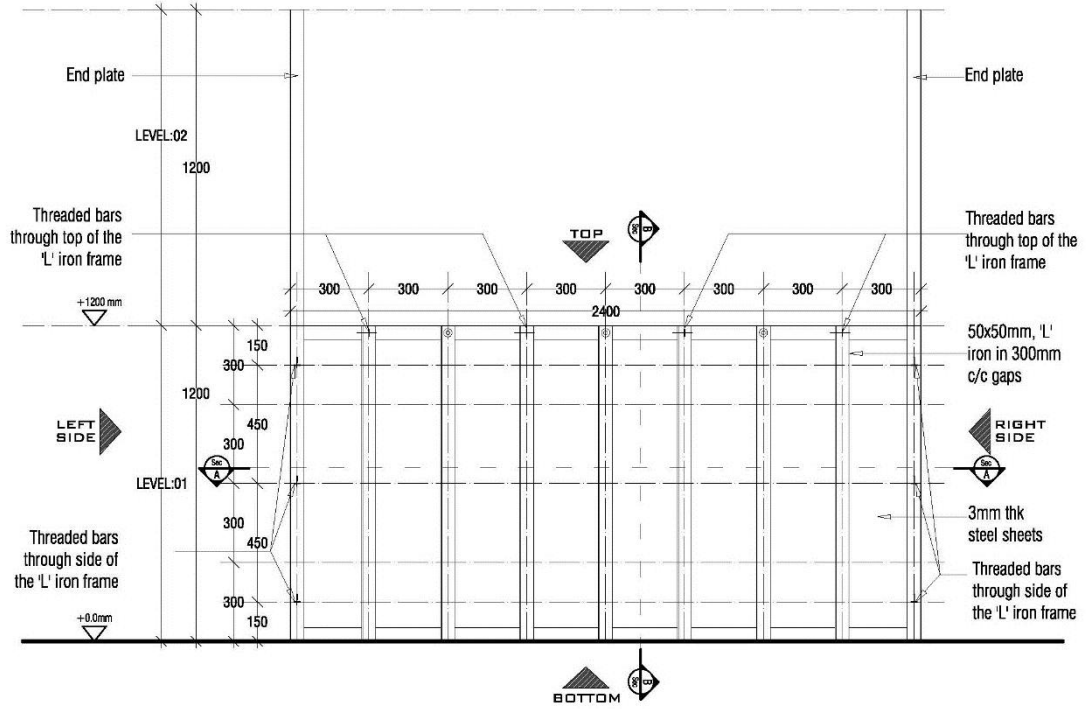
Formwork arrangement to typical wall segment – FRONT ELEVATION
